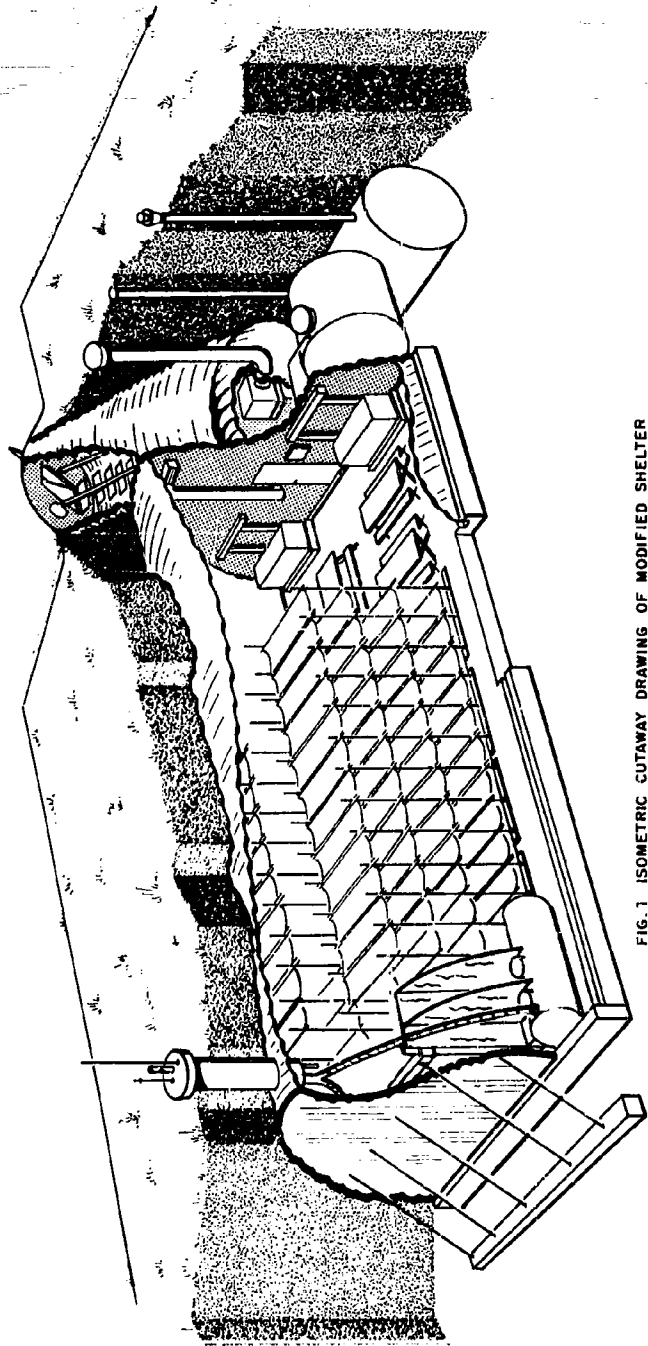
ISOMETRIC CUTAWAY DRAWING OF MODIFIED SHELTER
